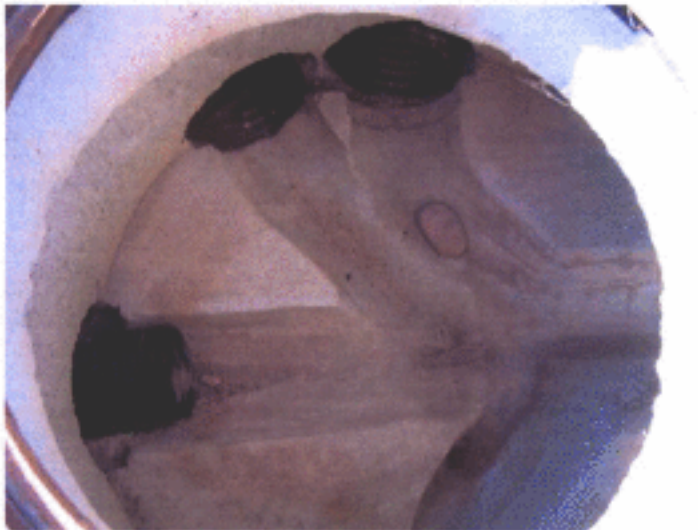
Manhole/Drain C at the base of the caps west slope 5/23/07
